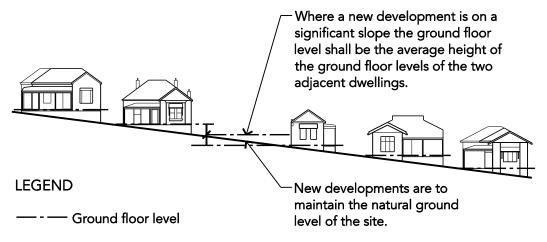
Street elevation illustrating ground floor level for new developments – Griffiths Architects 2012.
